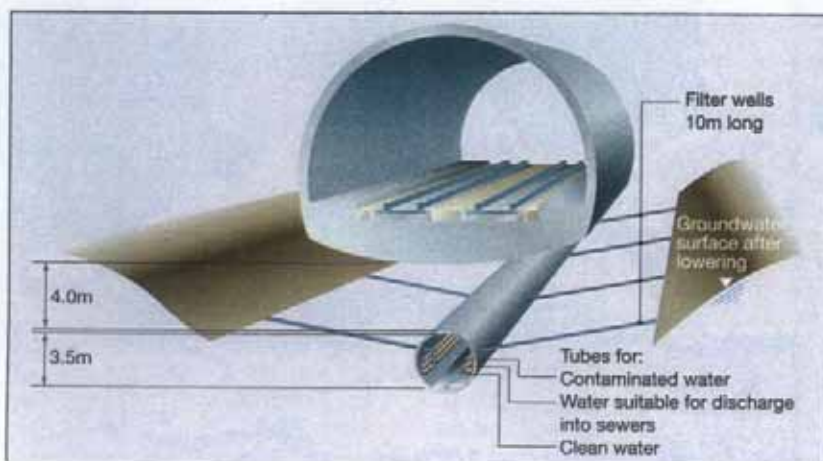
Groundwater collection and treatment system in the Fernthal tunnel
